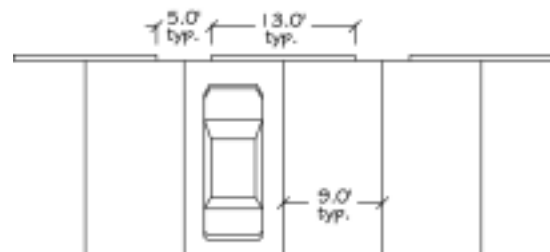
Use segmented curb to diffuse stormwater from parking lot where it flows to adjacent landscaping
